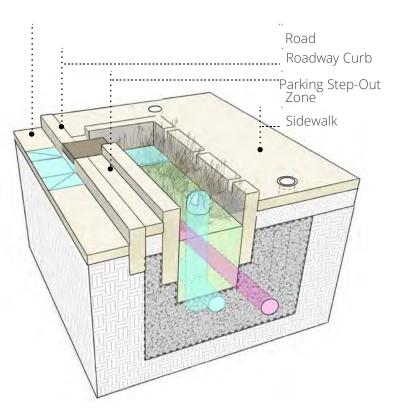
STORMWATER PLANTER MAINTENANCE ZONES
